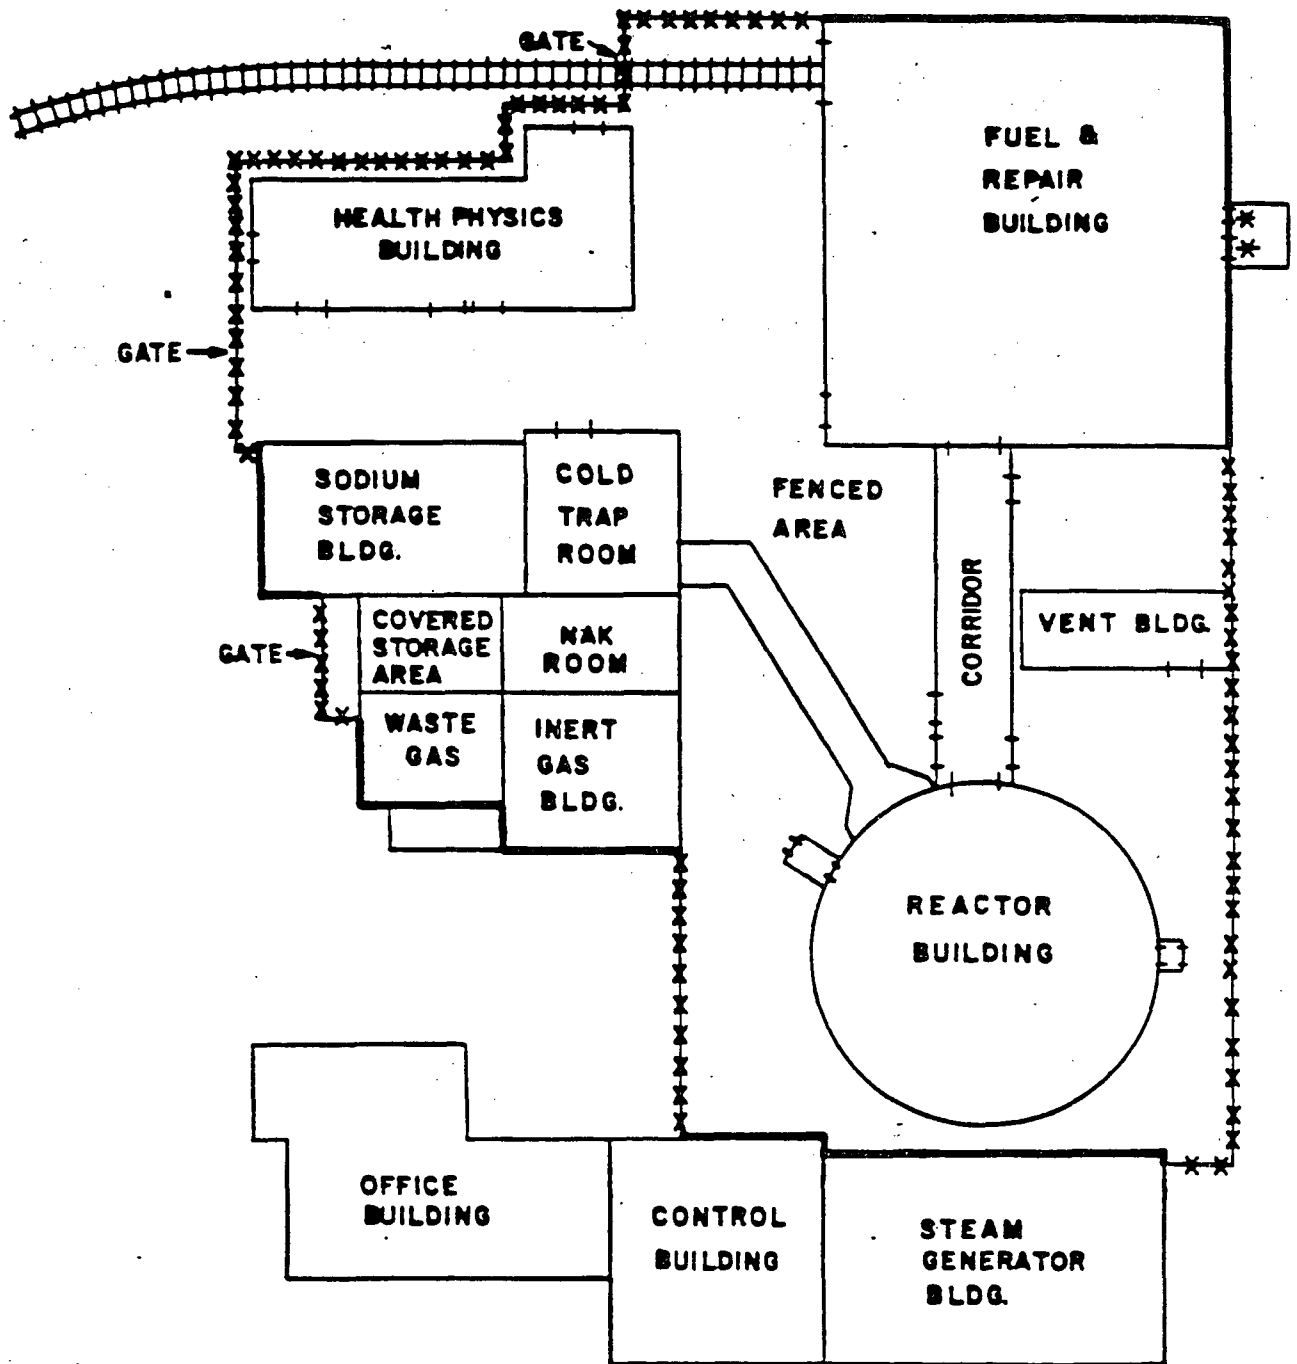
FERMI 1 FACILITY LAYOUT
